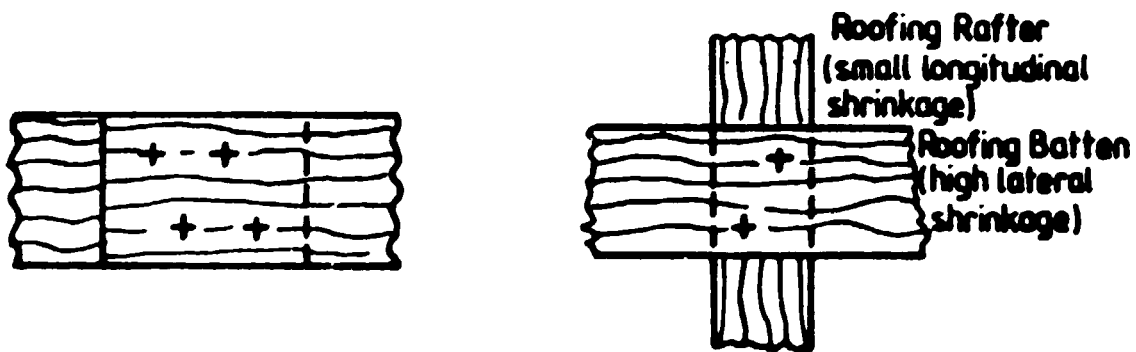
Staggered fasteners joining green timbers of different shrinkage properties
